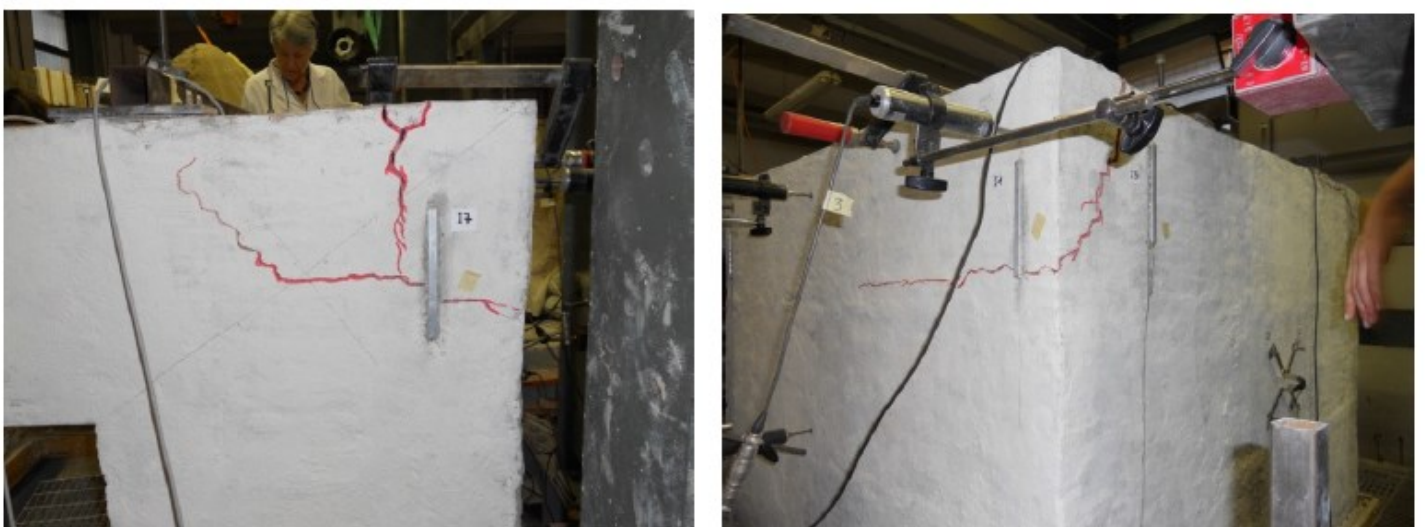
Detail of the cracks in the front wall at the end of the second test.
